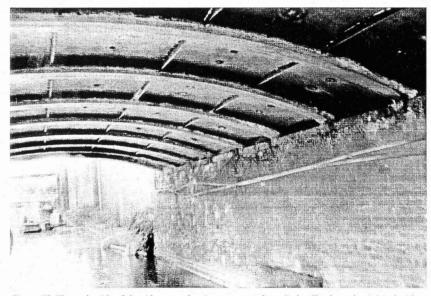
The underside of the side span, showing transversely arched soffit plates, buttjointed with stiffening ribs at the joints (Malcolm Tucker)
